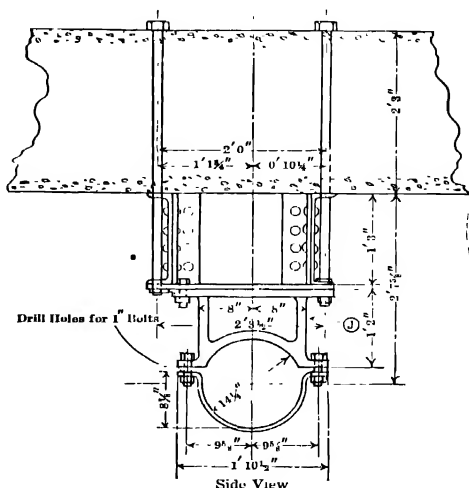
Pipe Anchor — Union Electric Light & Power Co.
